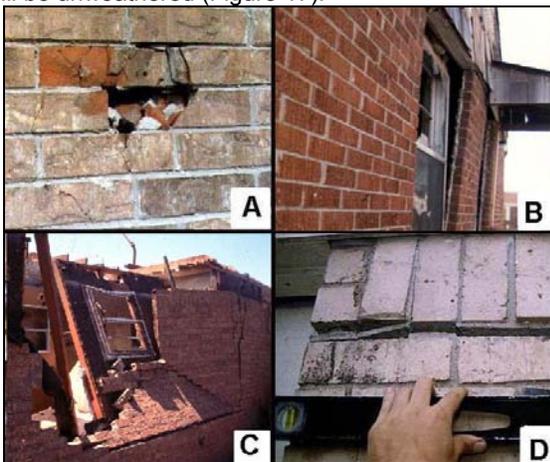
Wind damage to brick masonry: A) impact by flying debris, B) wall pulled outward, C) wall pushed inward, and D) movement in top course of masonry when roof was uplifted.
